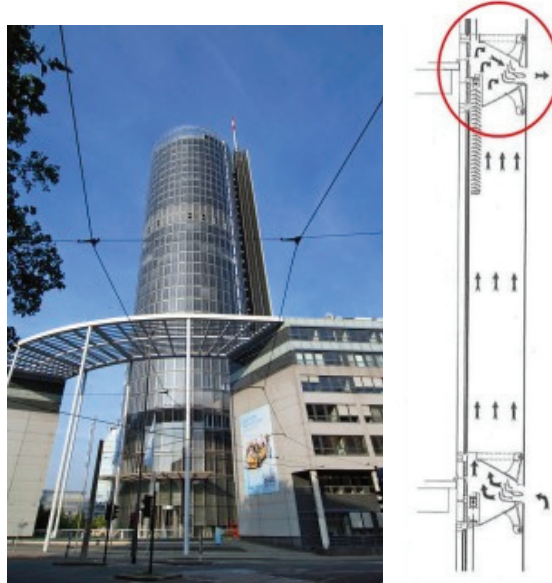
RWE AG Building Exterior and Fish-Mouth Window Detail
